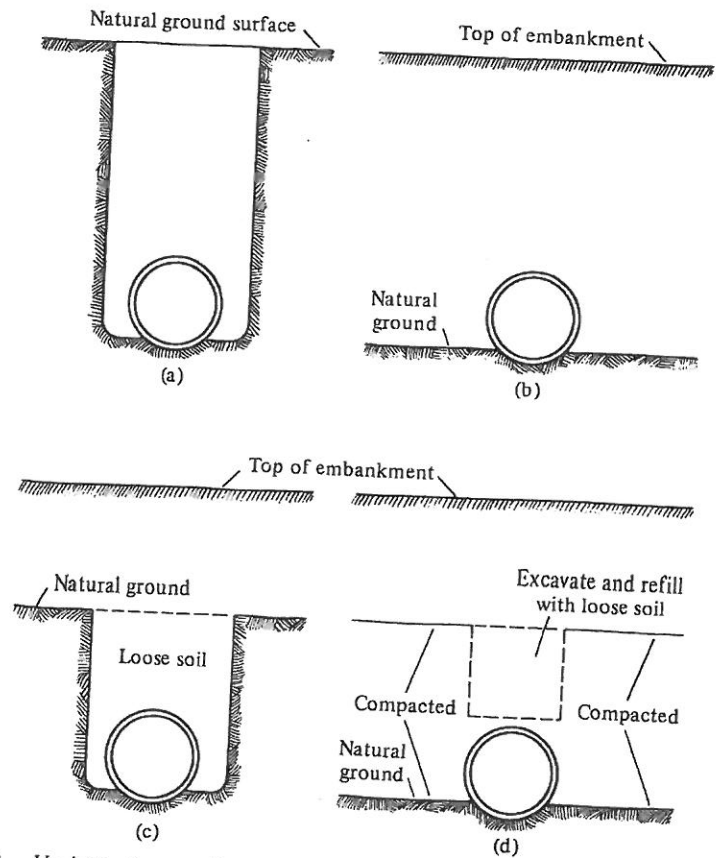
Various classes of conduit installations. (a) Ditch conduit; (b) positive projecting conduit; (c) negative projecting conduit; and (d) imperfect ditch conduit.
